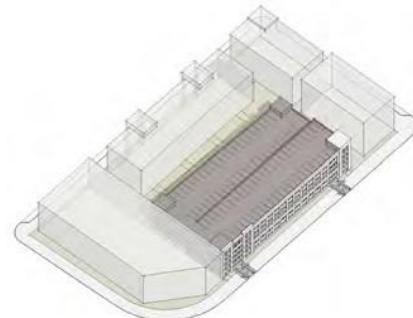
Example of stand-alone parking structure, wrapped by building
